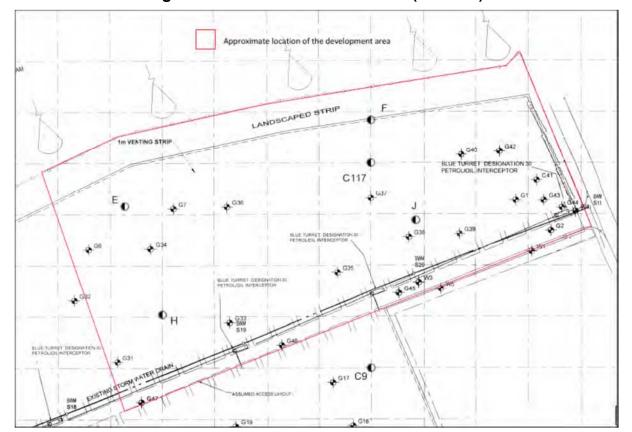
Borehole Trial Pit Plan (Ref 14.7)
